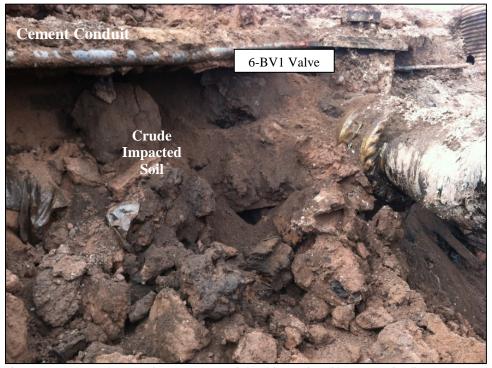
6-BV-1 valve and cement conduit with crude oil impacted soil.
